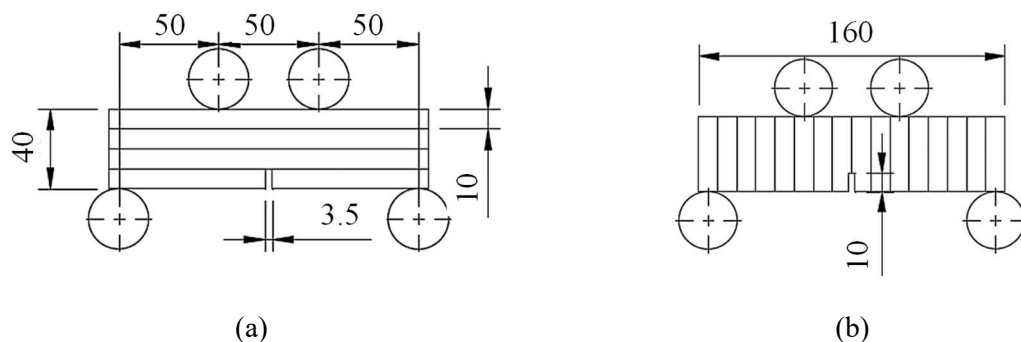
Crack mouth opening displacement fracture samples, illustrating the (a) Longitudinal (FPB-D1) and (b) Perpendicular (FPB-D3) configurations, respectively.
